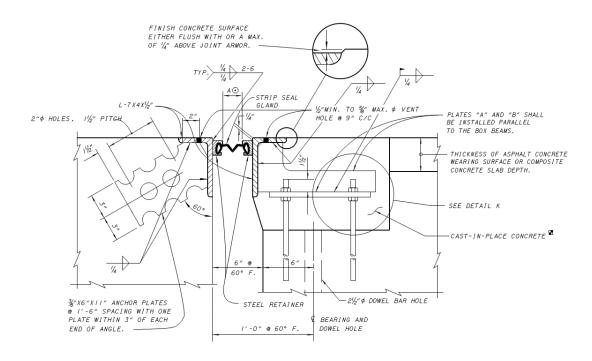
ODOT strip seal joint detail (concrete box beam bridge)
